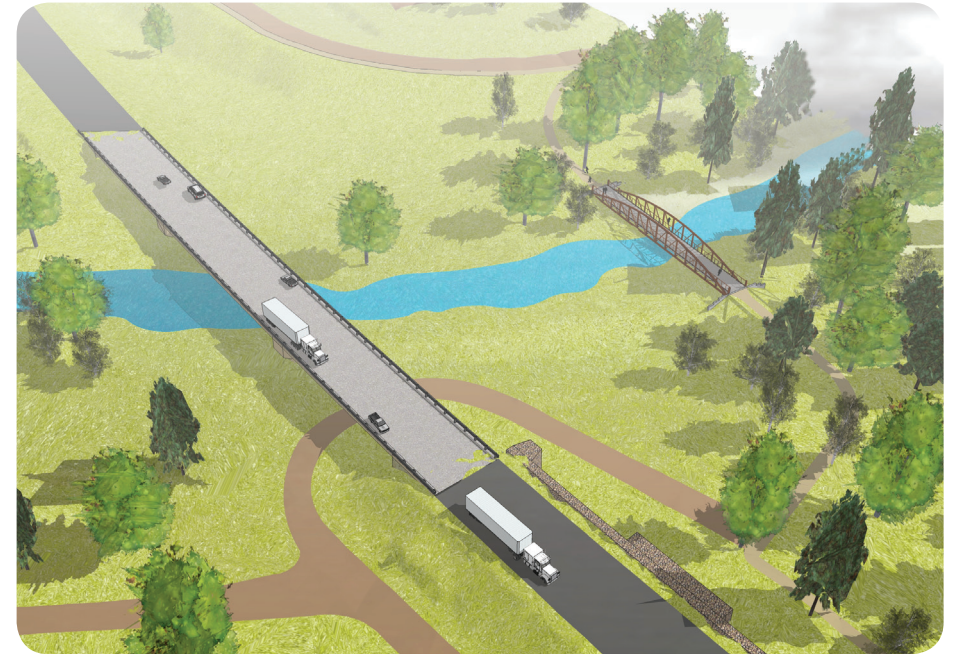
Bird's-eye view of vehicle bridge and pedestrian bridge looking south.
